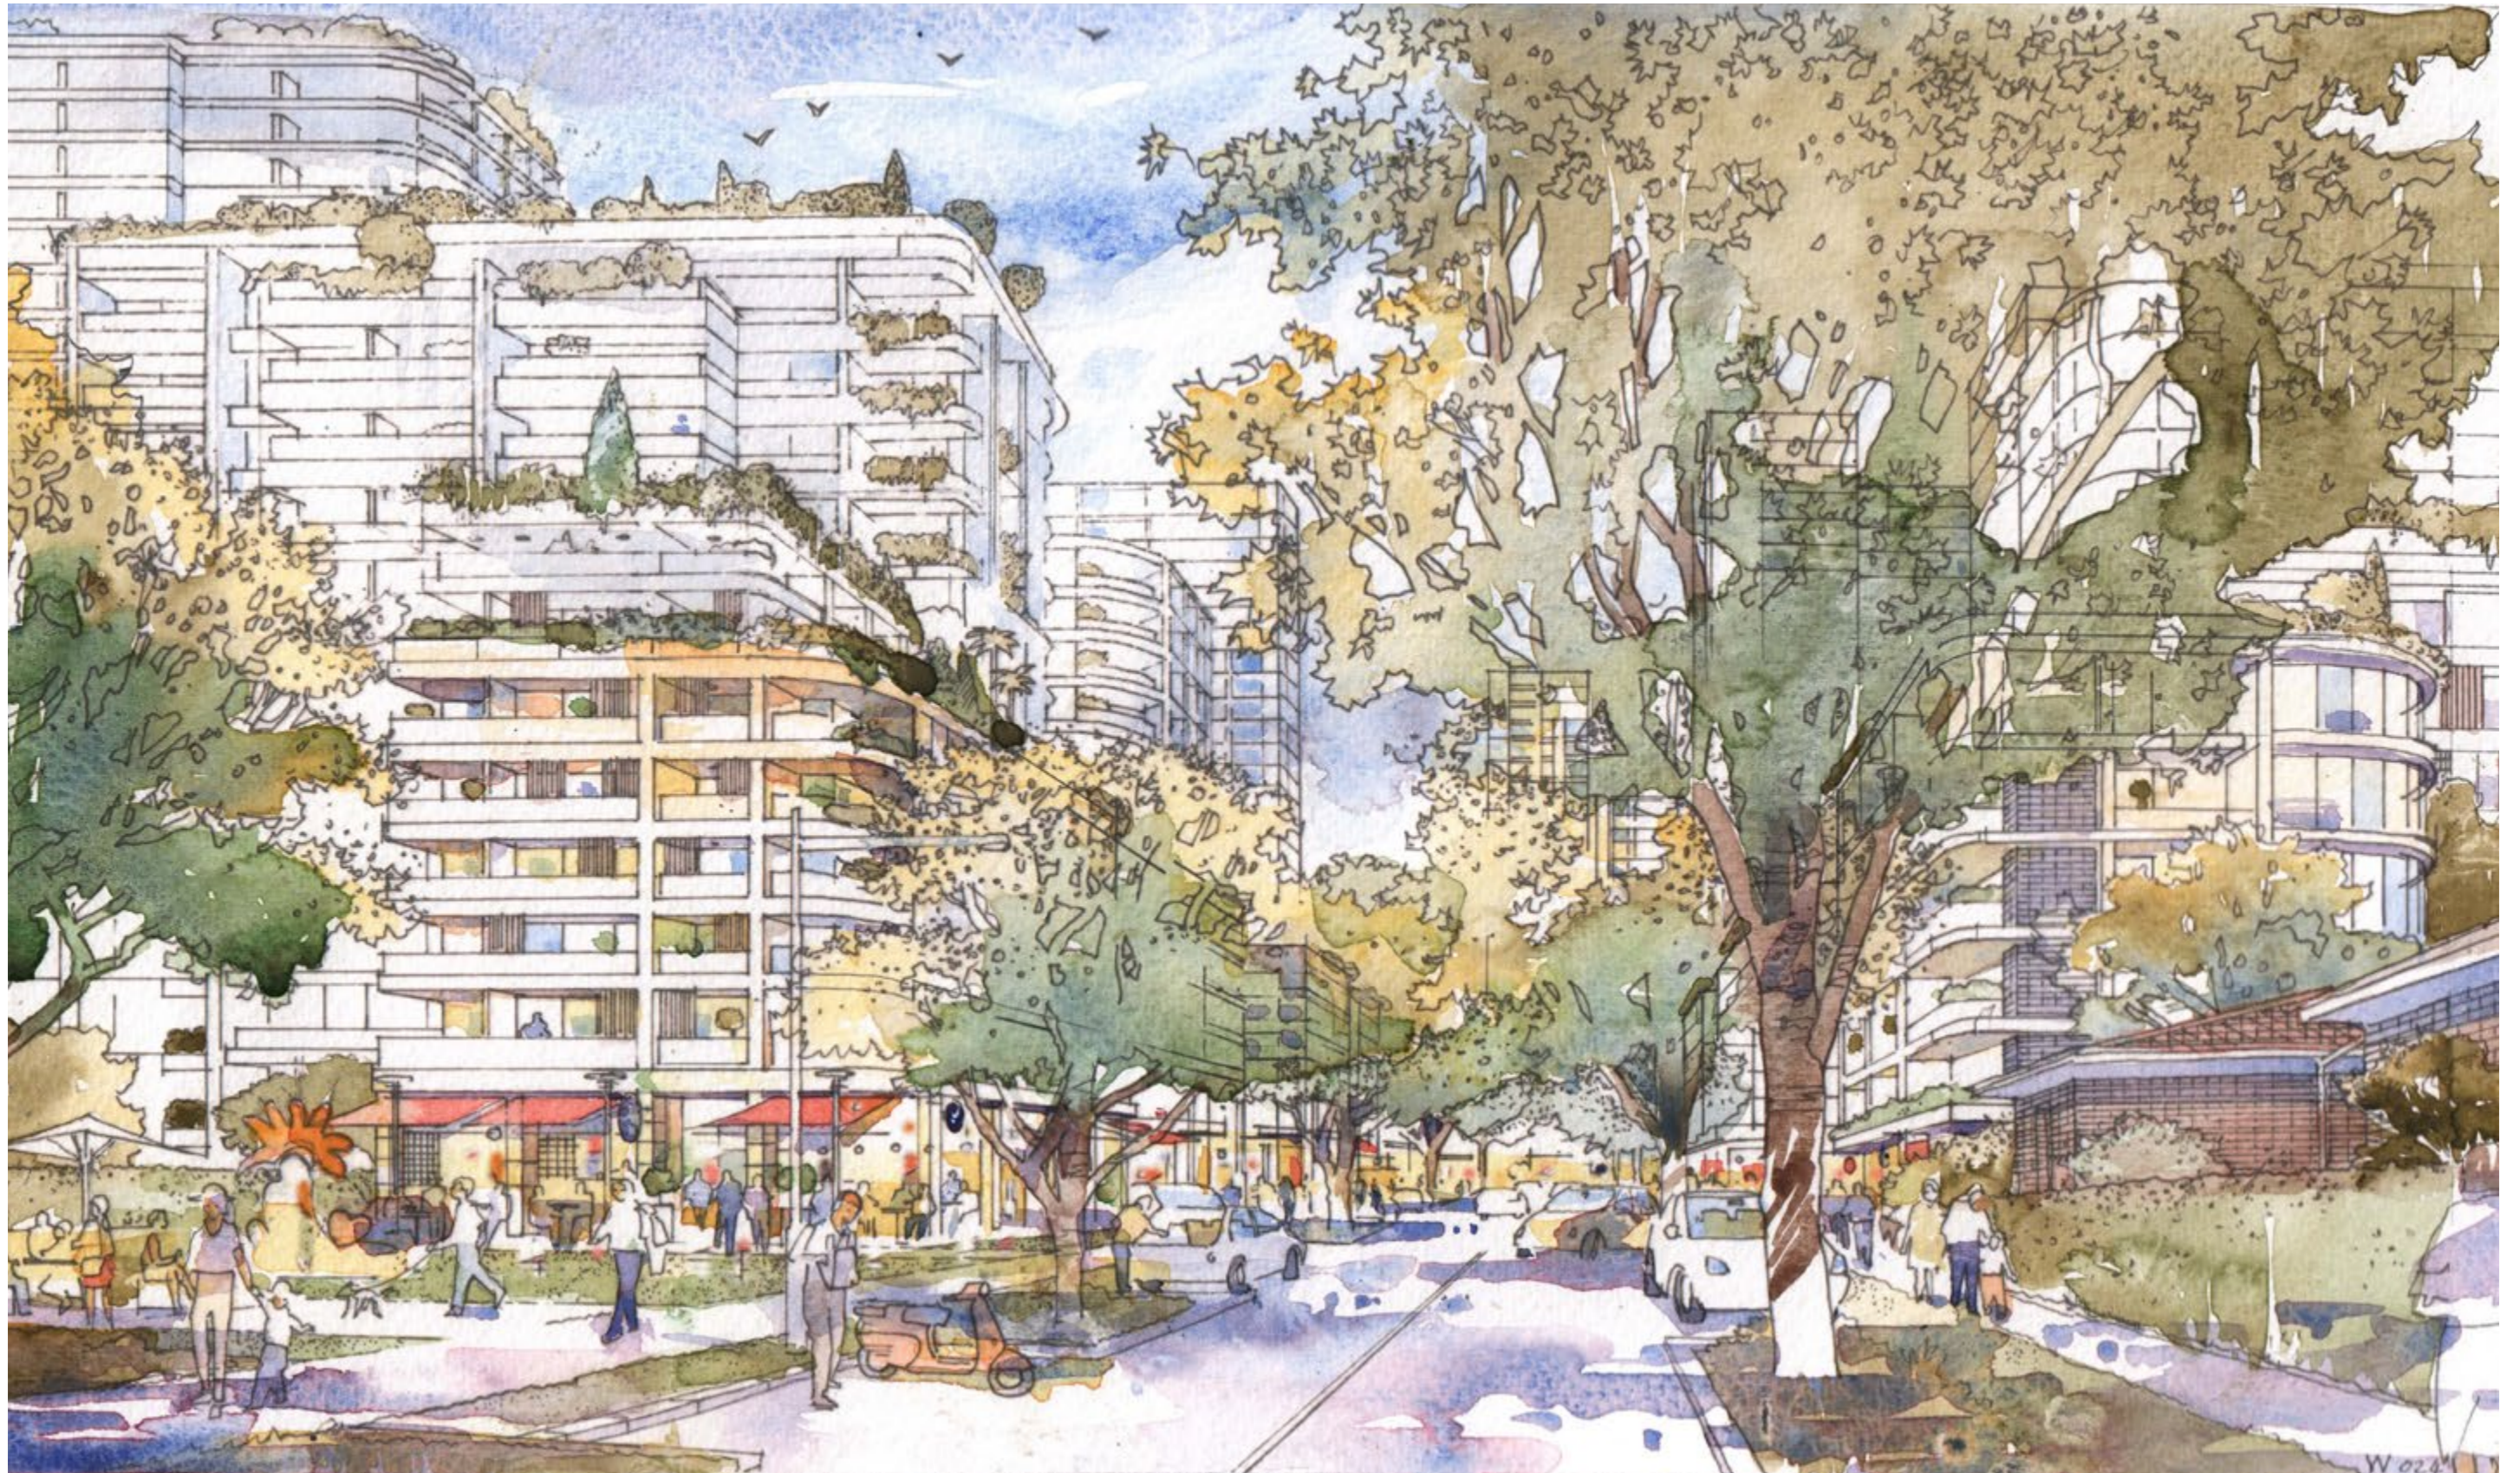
Artist's impression of the proposed pocket park and Slow Street along Waimea Street, looking west towards the Burwood Town Centre
